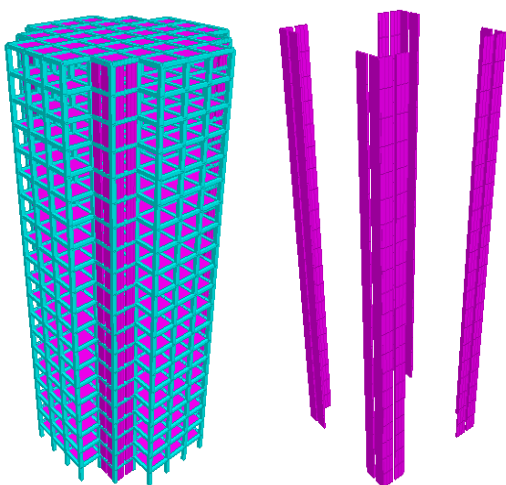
Building SOC: Shear wall with 14.28 % opening
